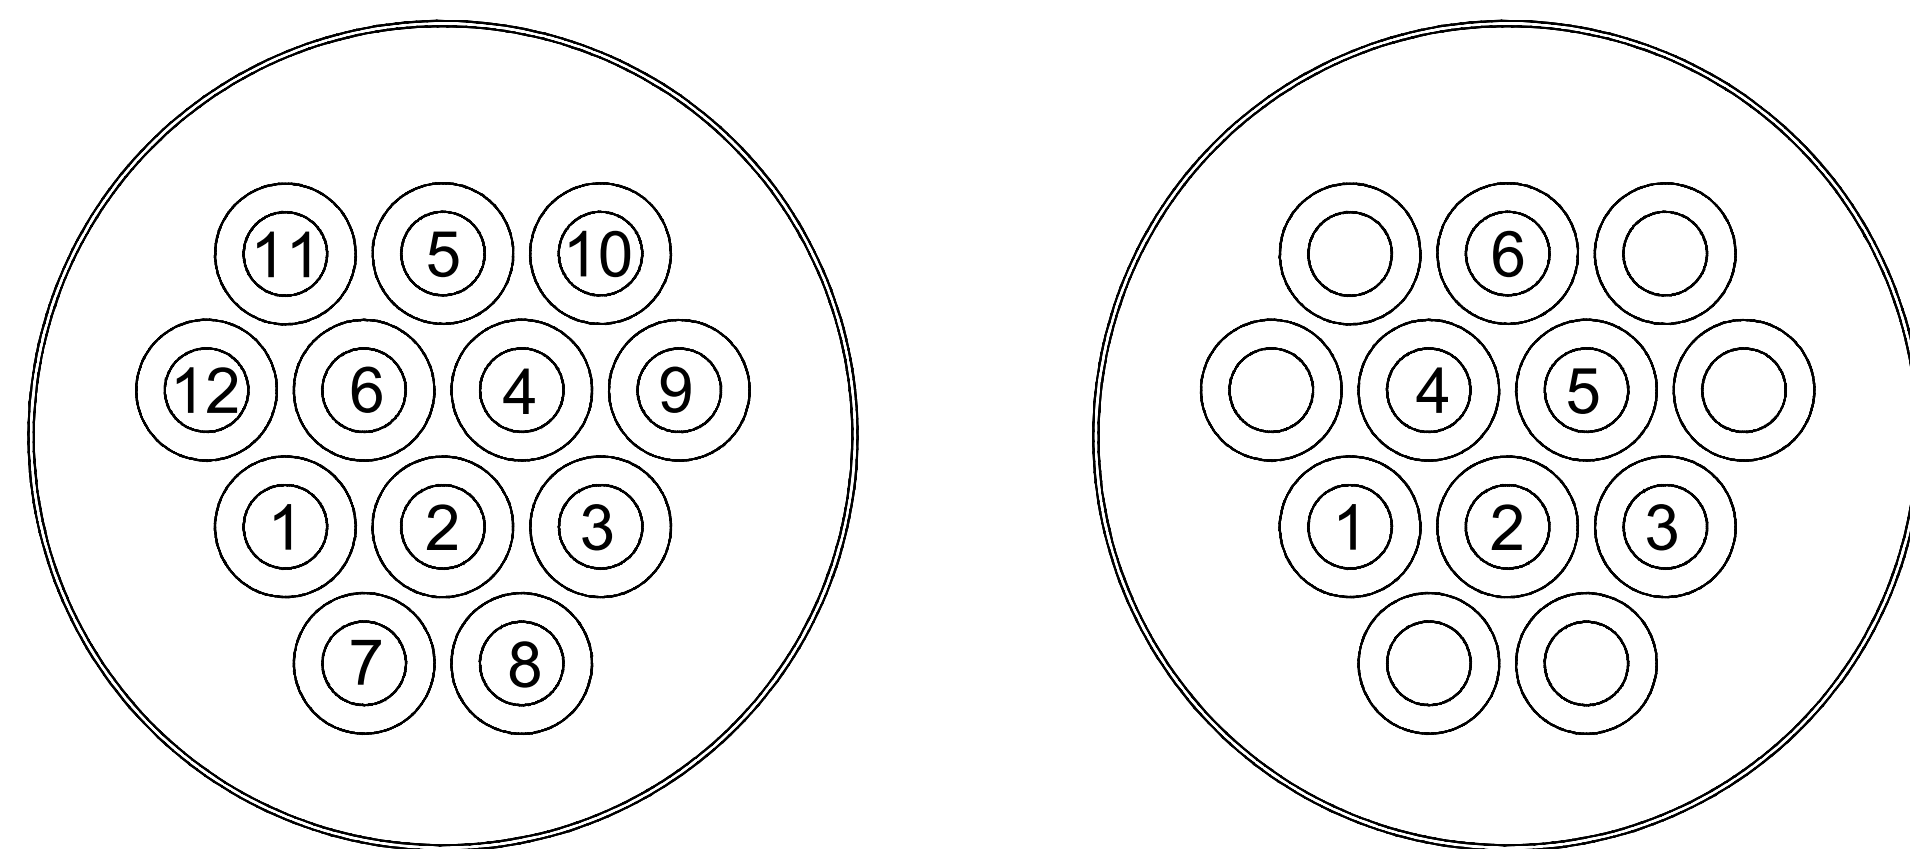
Layout of prestressing strands in post-tensioning anchor heads for Internal and External specimen
